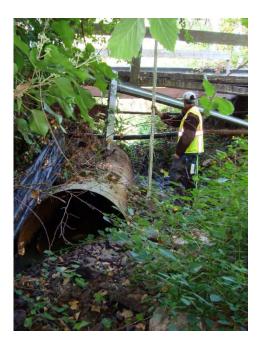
Culvert placed in debris from washed out bridge to convey Hedges Creek.
